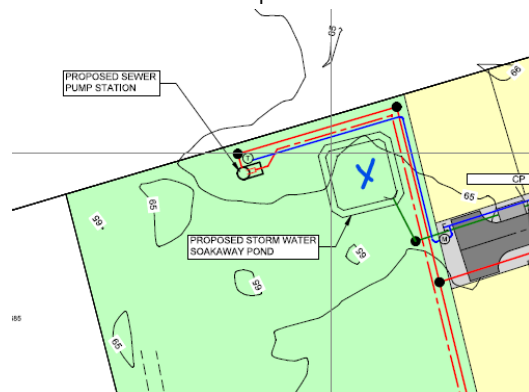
Plan to show the proposed stormwater soakaway pond marked by the blue cross (V3 Consulting Engineers, 2025)
